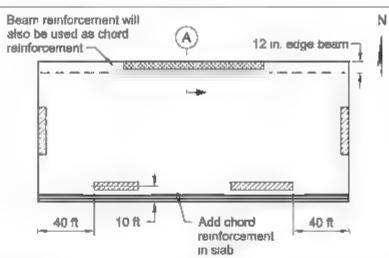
6—Suggested chord reinforcement at the north and south edges of the diaphrugm
